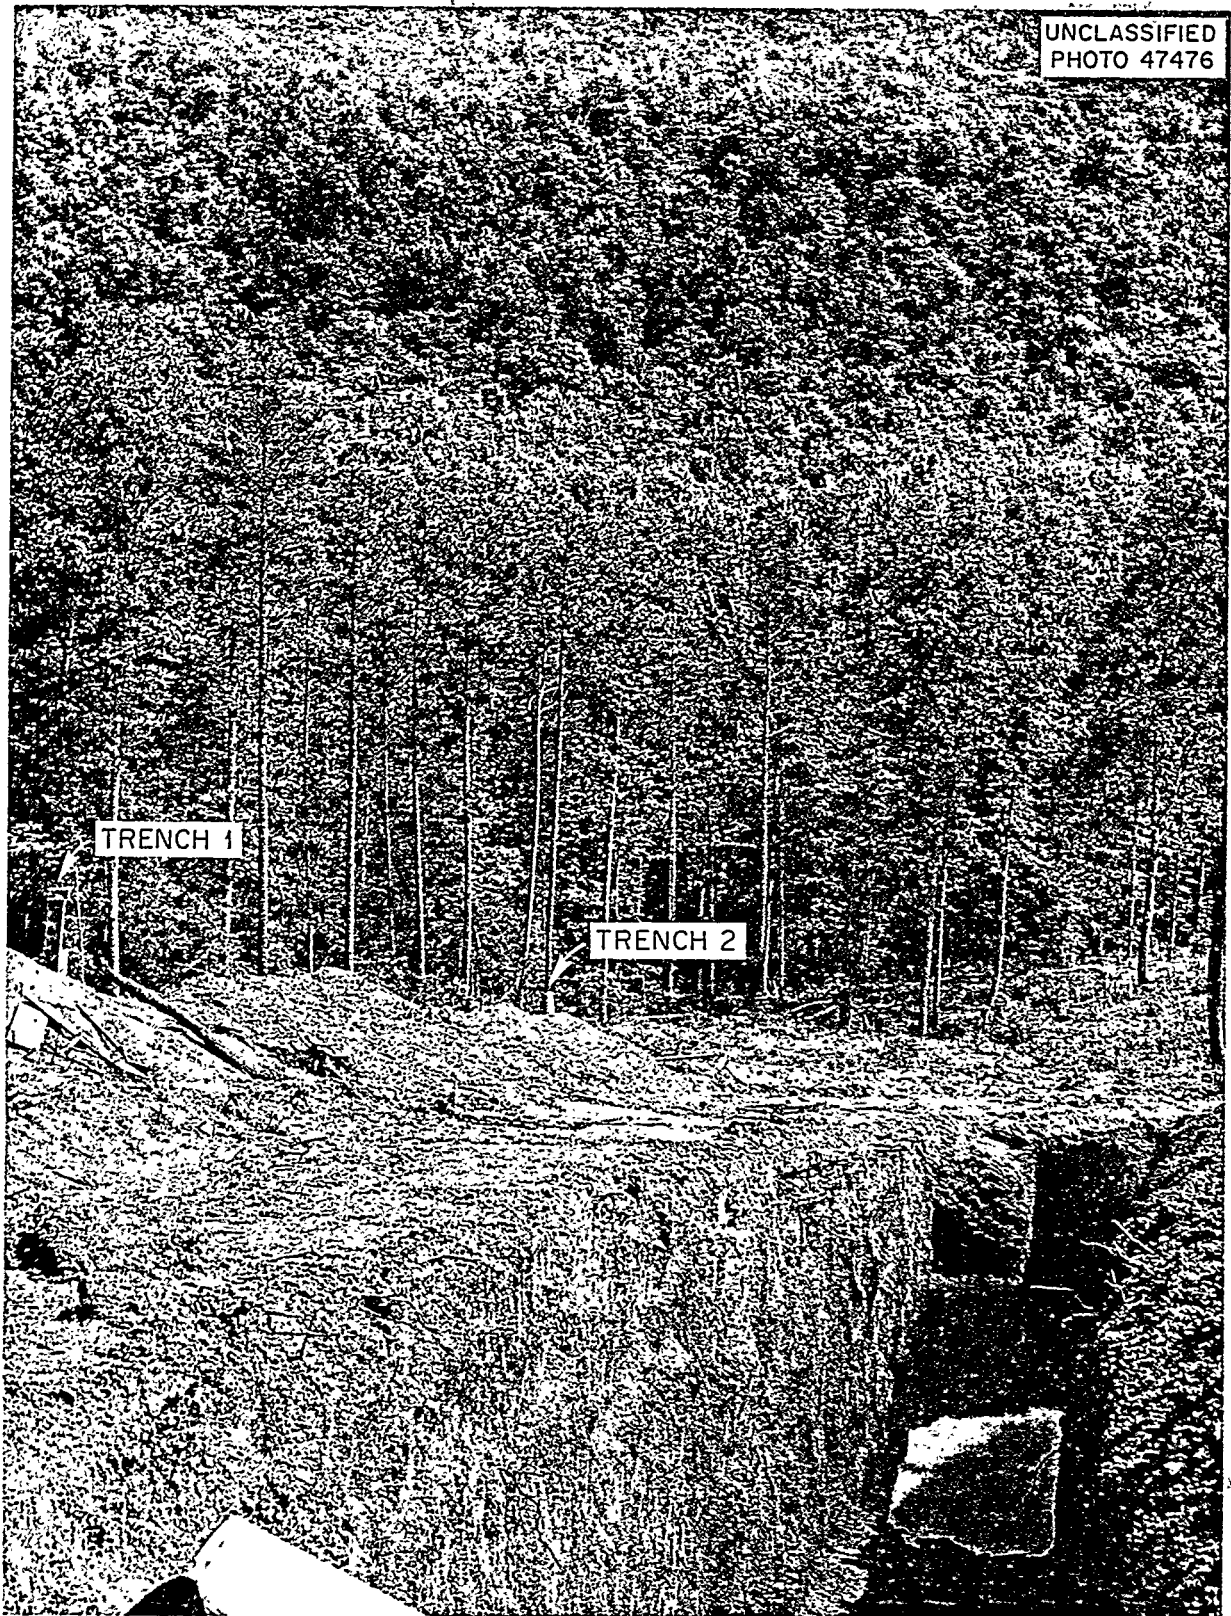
Standing Water in Open Trench Adjacent to Y-12 Waste Trench 2.
